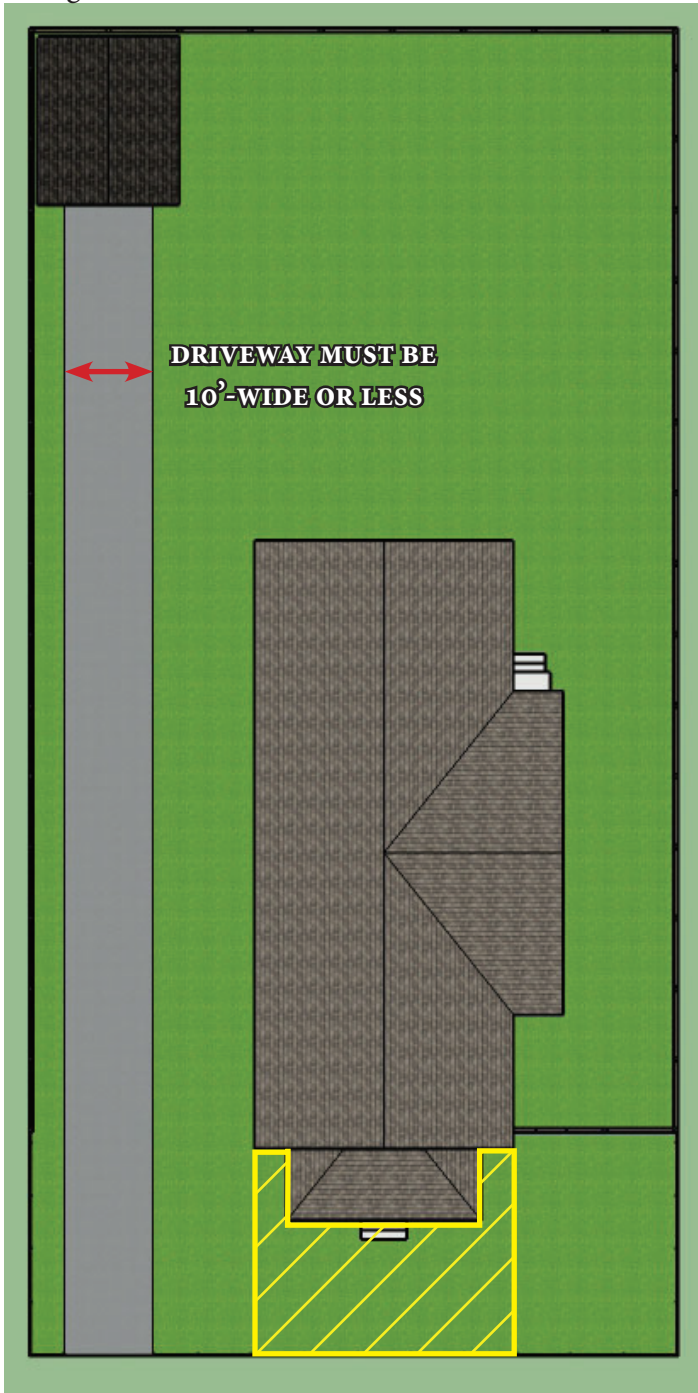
For interior lots, driveways that are not adjacent to the house and provide access to garages must be 10'-wide or less to be considered under the ACoA process. The driveway may be located on either side of the dwelling. Any parking areas directly in-front of the dwelling (area shaded yellow) would be inconsistent with the character of the historic district and require a CoA.
